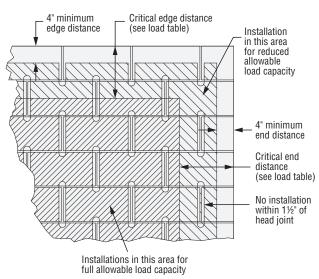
Allowable Anchor Placement in Grouted CMU Face Shell
